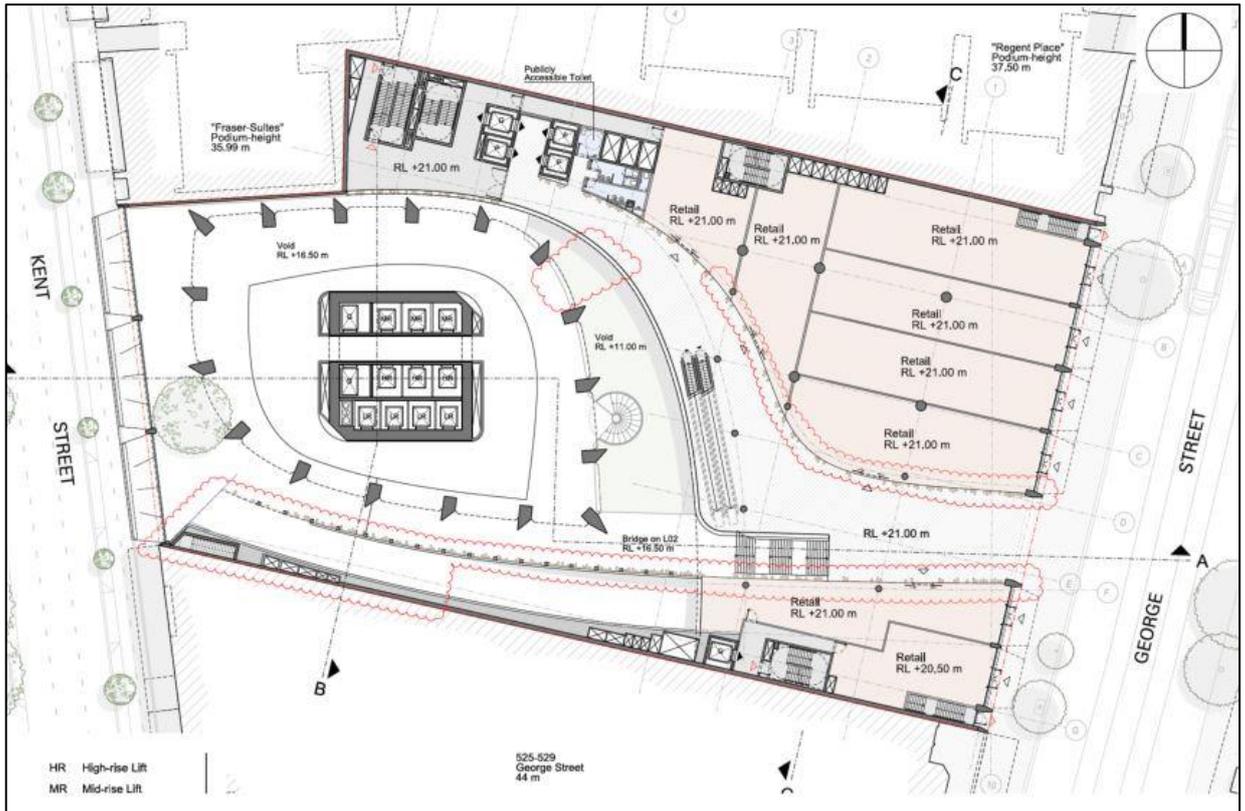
George Street ground level podium floor plan - retail and publically accessible toilets (referred to as level 1)
